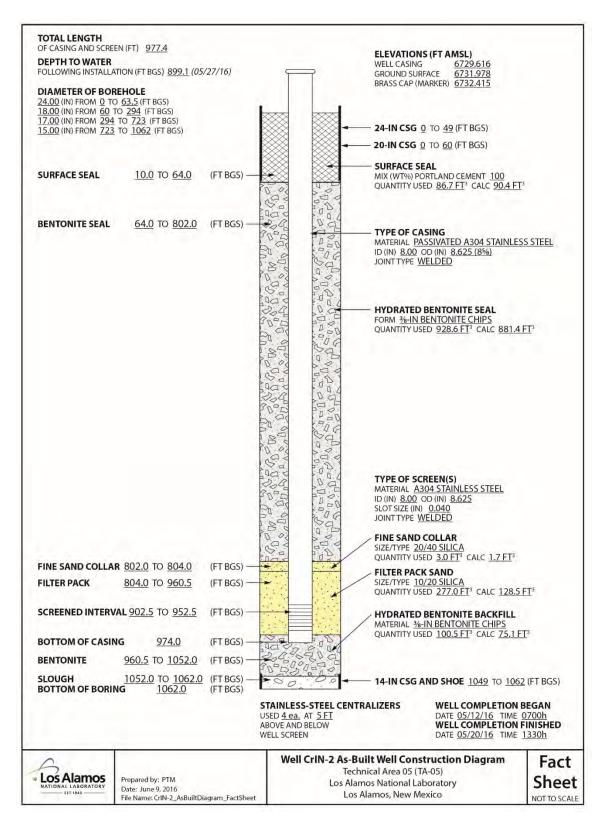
Injection well CrIN-2 as-built well construction diagram
